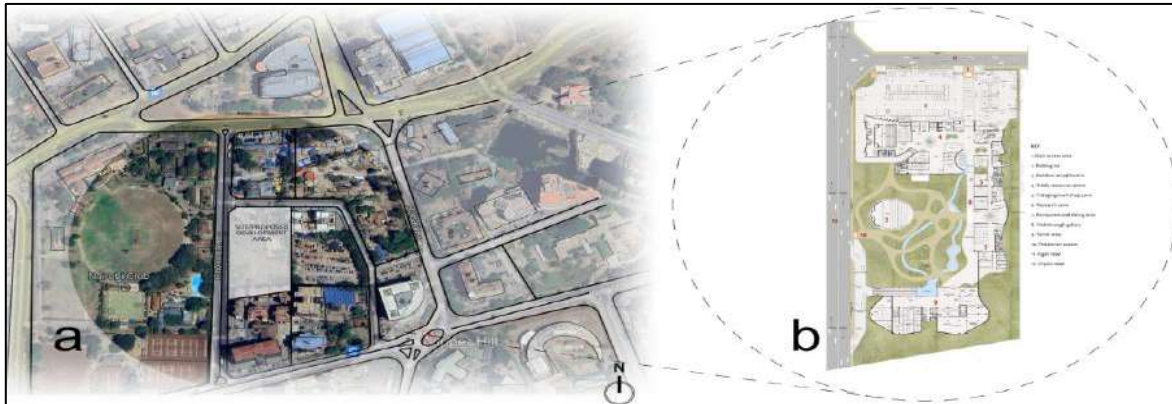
Site location (a) and Site Plan (b) . Source: Author generated; 2024
